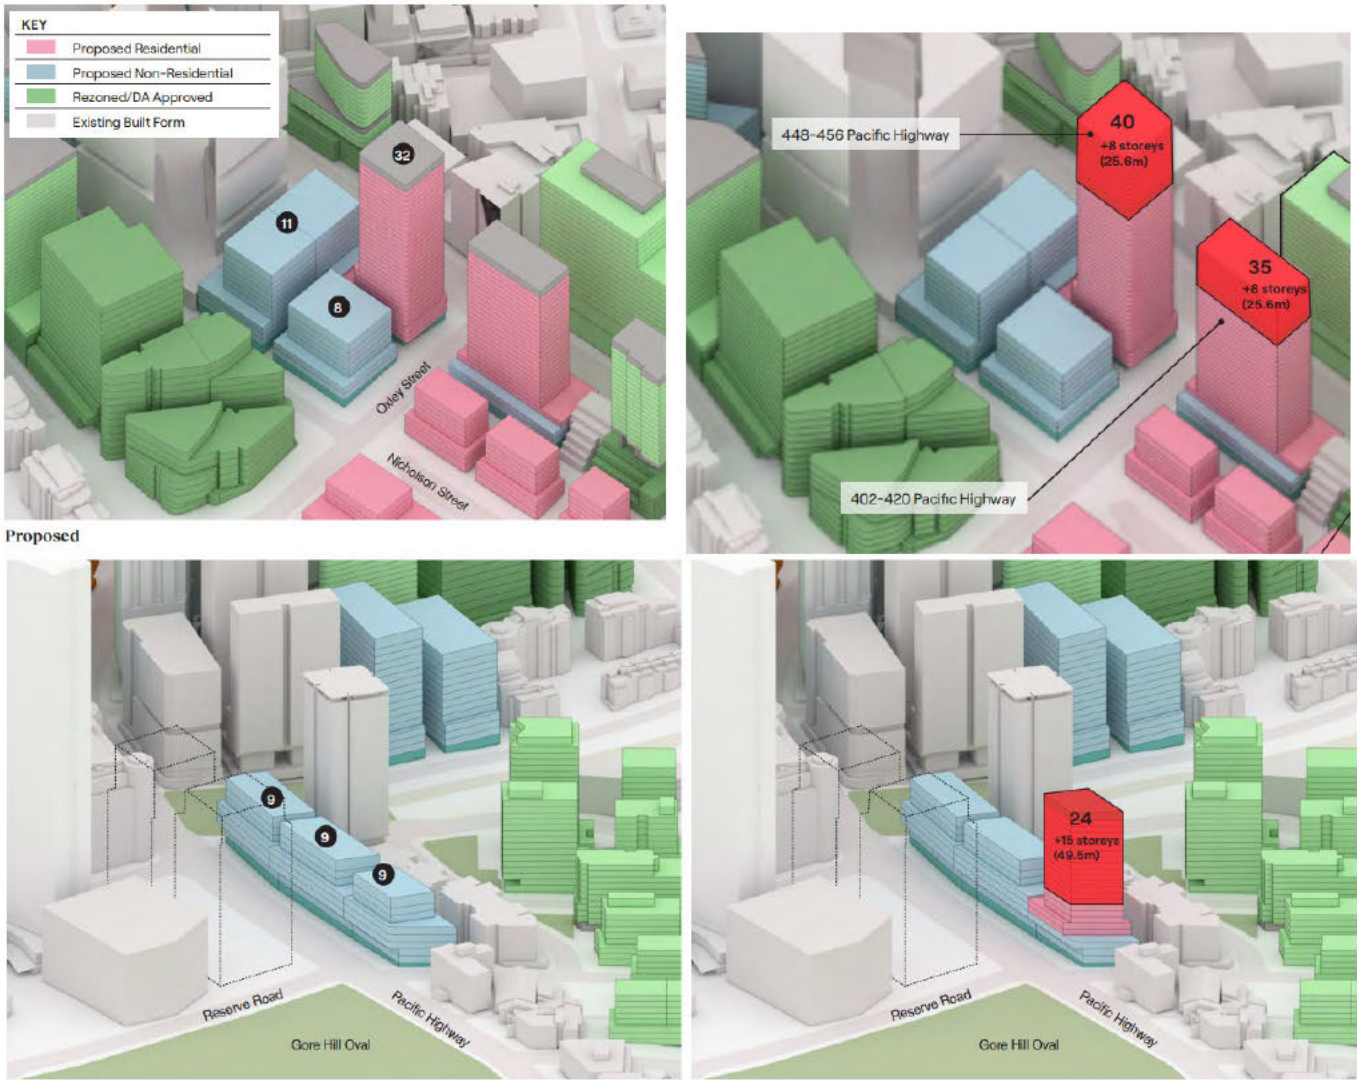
Extracts of Masterplan Block 5 (Above) and Block 7 (Below) (Source: SJB Architecture, 2024)
